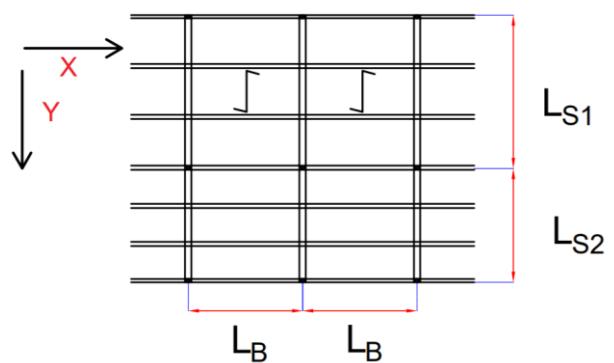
Structural Scheme for Cell Office with Composite Slab floor system.
